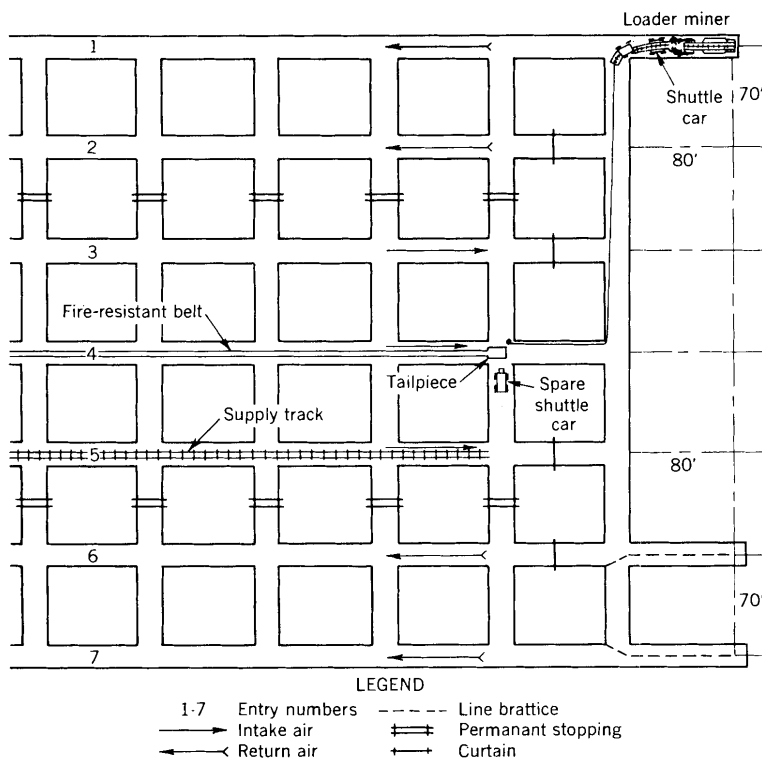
Face Ventilation System and General Arrangement of Mining Equipment.
